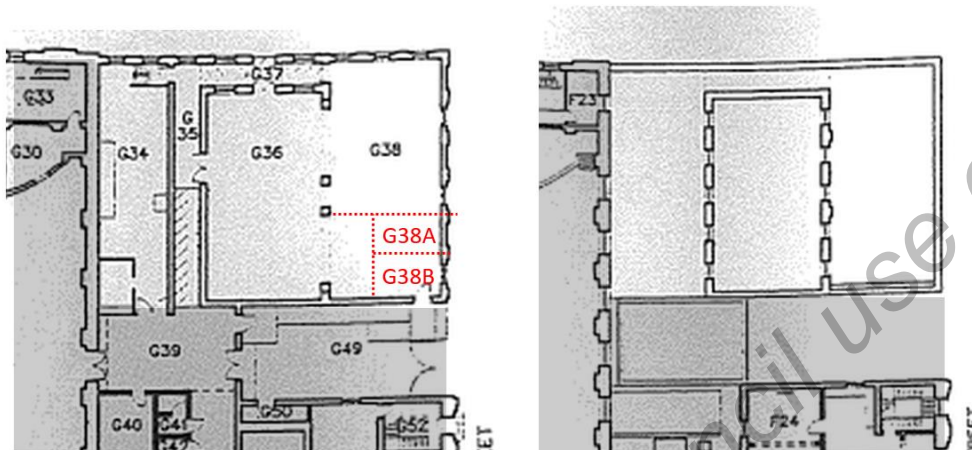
Ballantyne Room Building plan arrangement (Ground floor – left; First floor – right).
